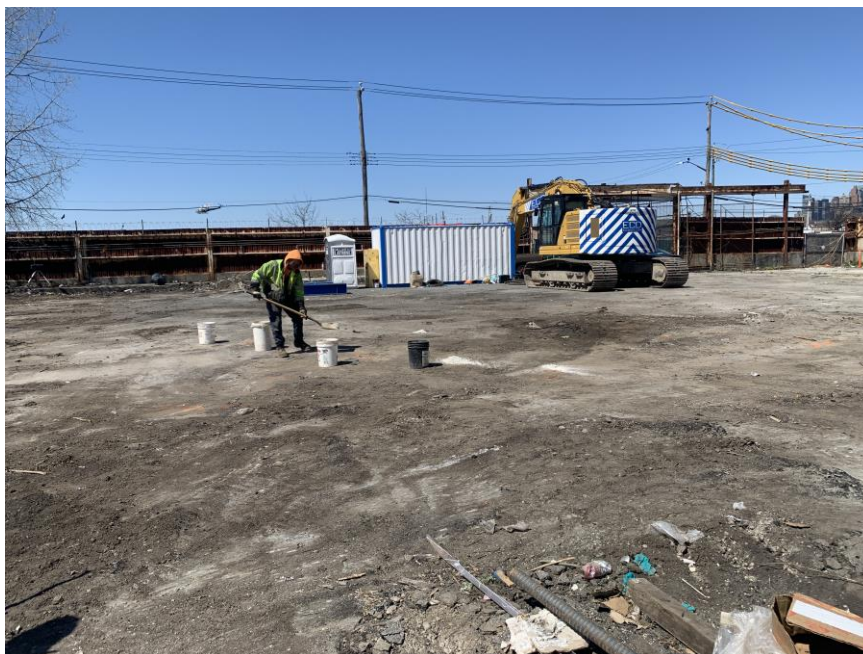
Eastern restoring boring locations in the western part of the stie with clean sand to surface grade (facing west)
